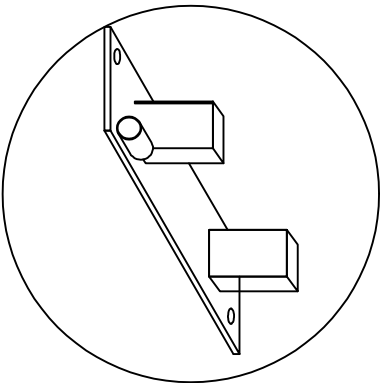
BASE PLATE FOUNDATION 3D VIEW
